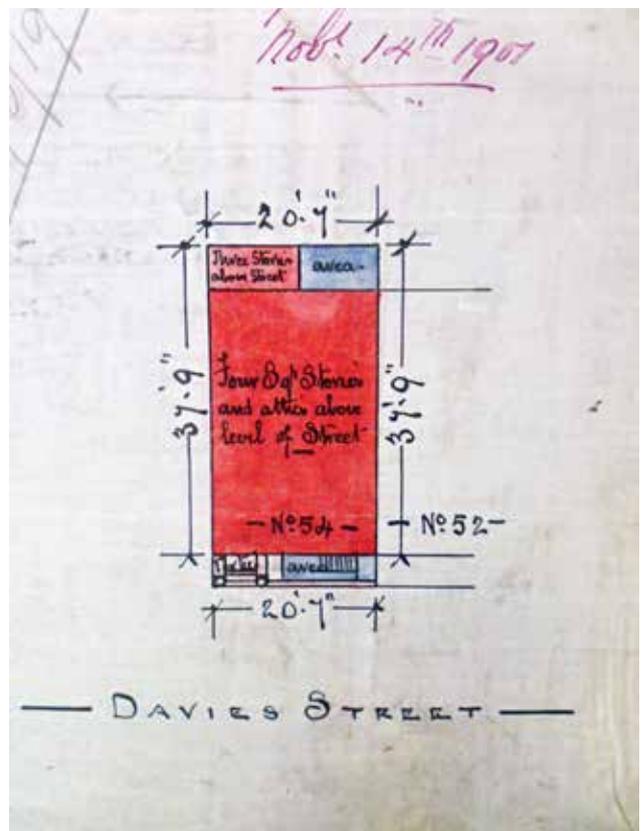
Lease plan of 54 Davies Street showing three storey closet wing extension (Grosvenor Archive).
